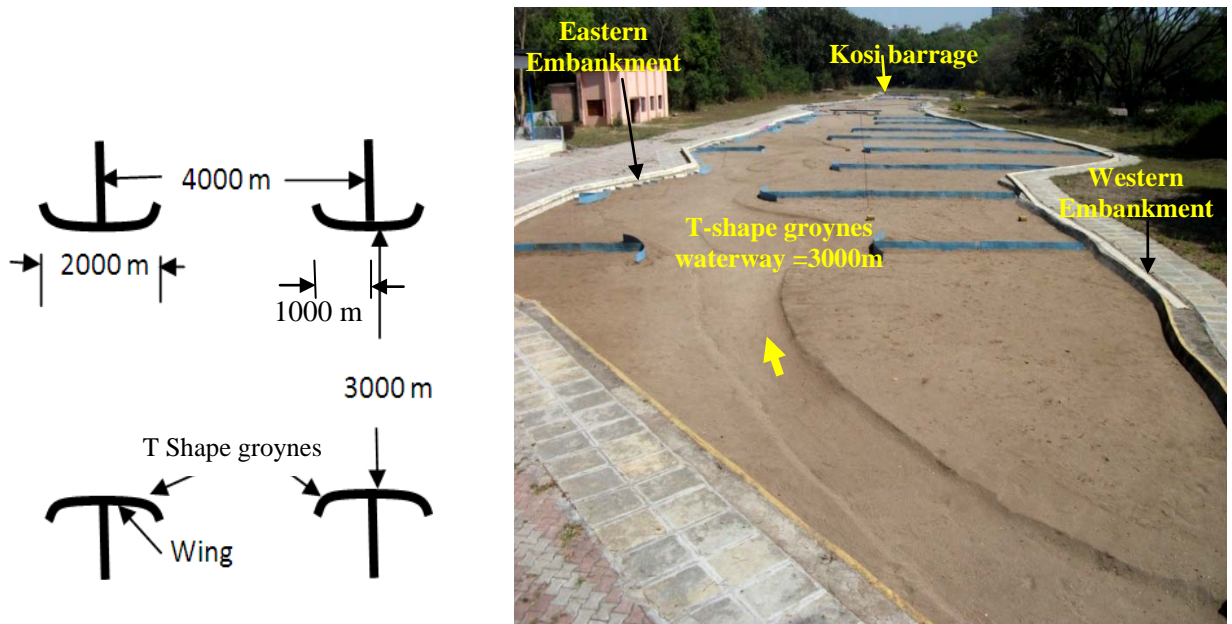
a) Details of T-shape groynes provided for water way of 3,000 m in the model
